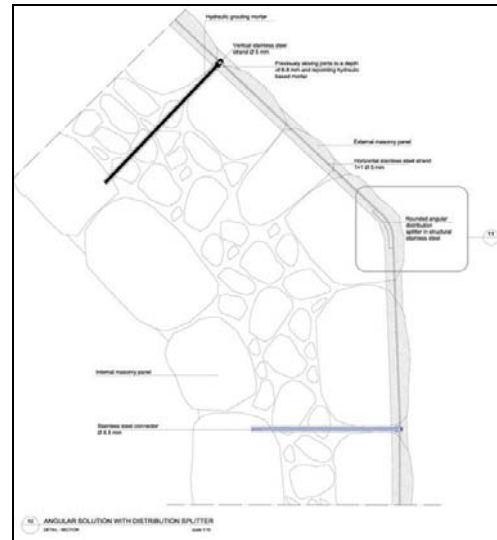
Masonry study in order to determinate steel strands layout and to ensure the correct knit dimension and shape - Plan
